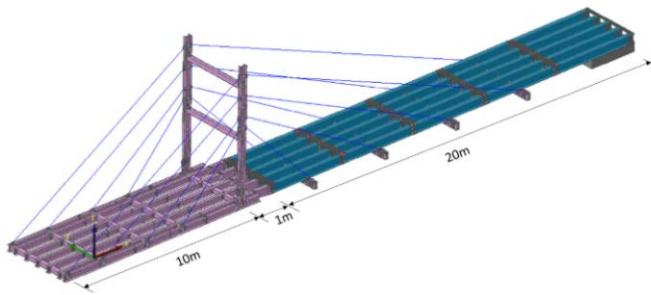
Cable-stayed bridge diagram with pGFRP in blue and steel elements in purple. Source: [19].
